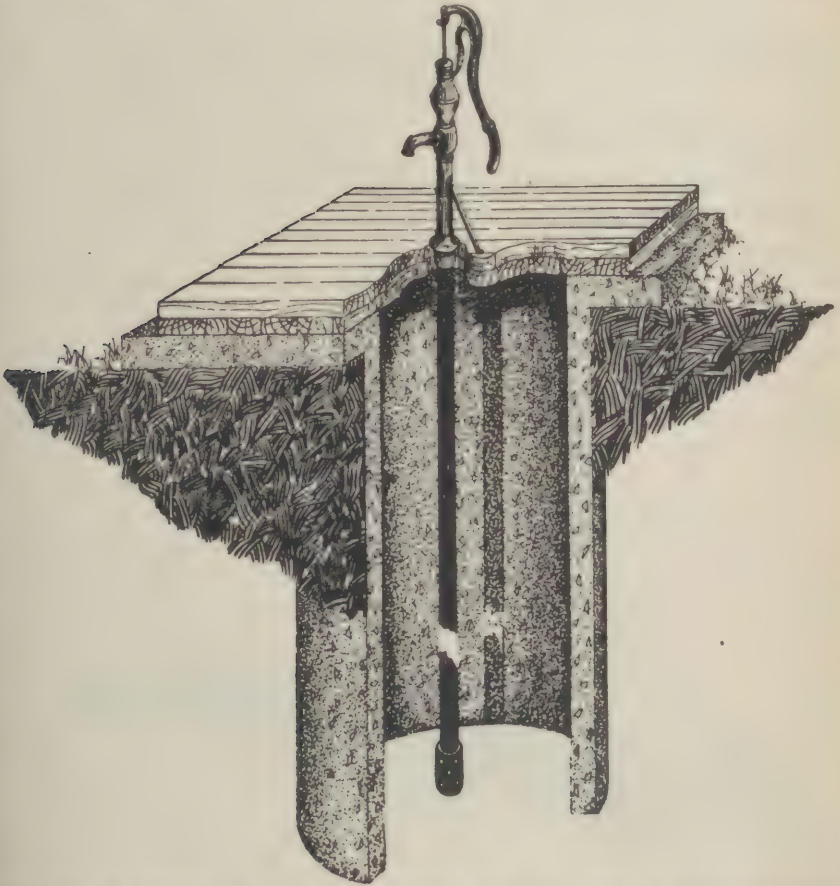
Method of protecting shallow dug well from surface contamination (Schematic). Wooden platform with concrete base. Concrete casing.
